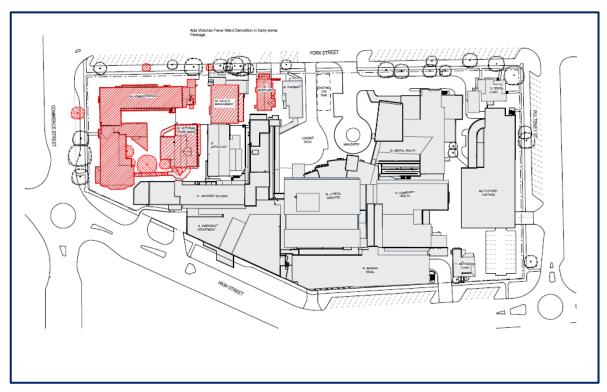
Buildings to be demolished across the hospital site (courtesy: BVN Architects)
